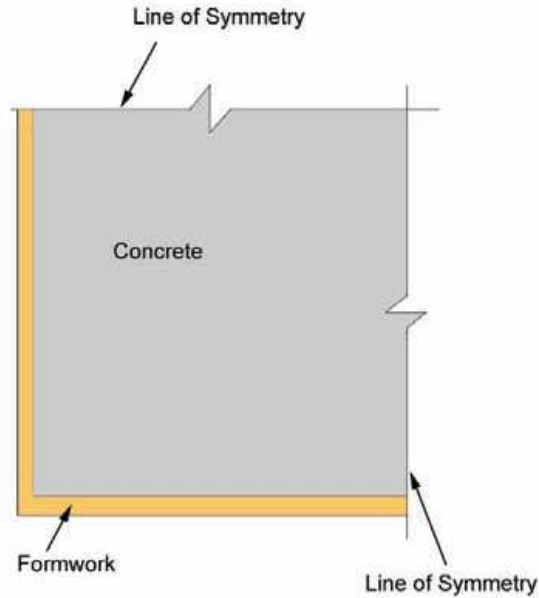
Square column model used by ConcreteWorks (Riding 2007)
